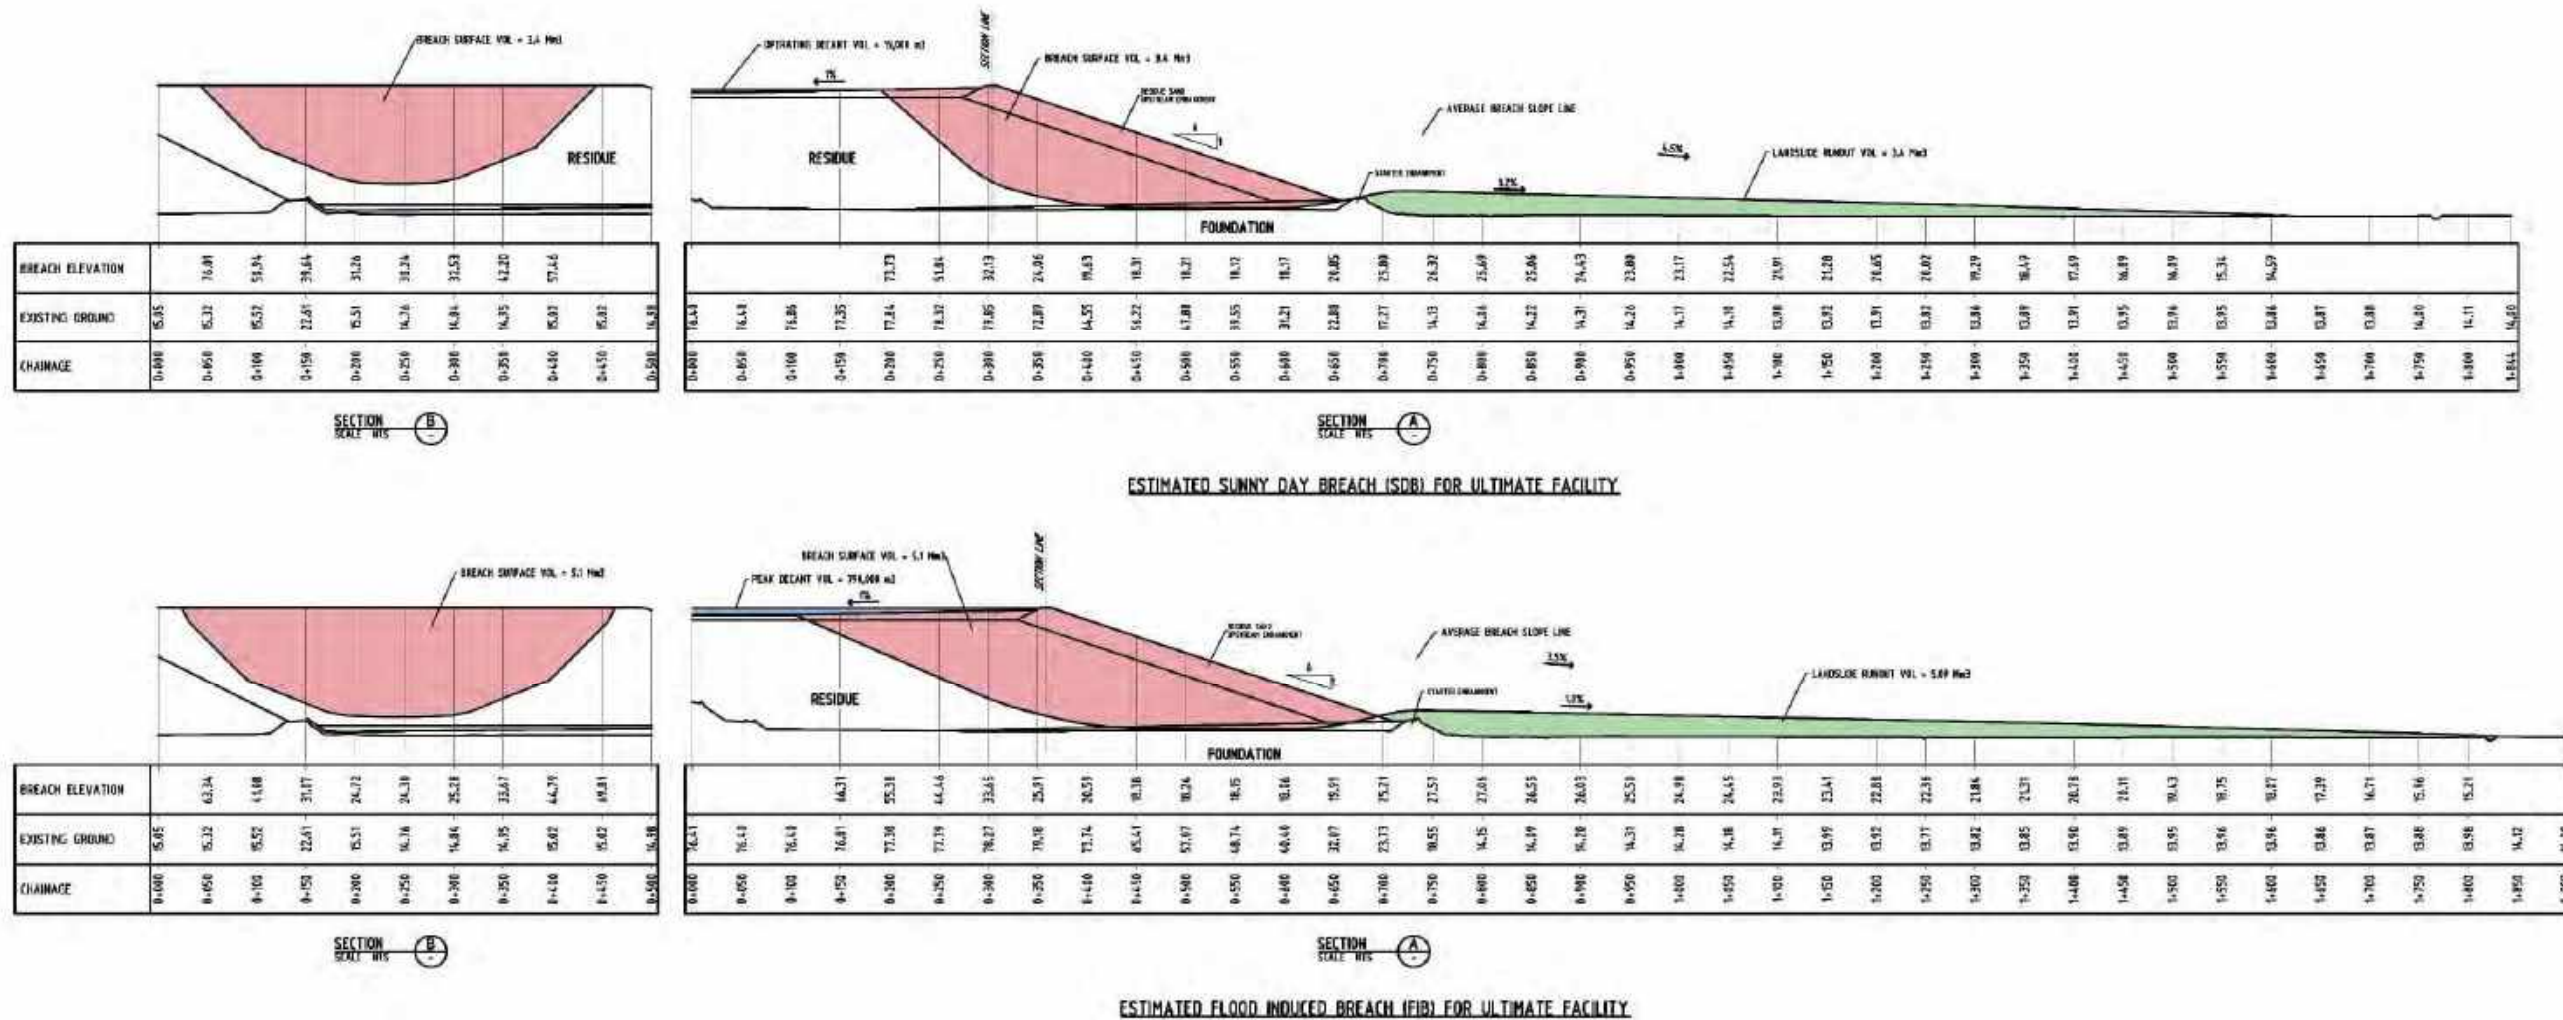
Geometric Breach Section View for Ultimate Facility
